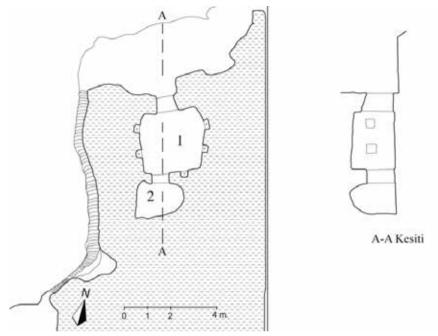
Architectural plan of Multi-roomed Rock-cut Tomb III.
